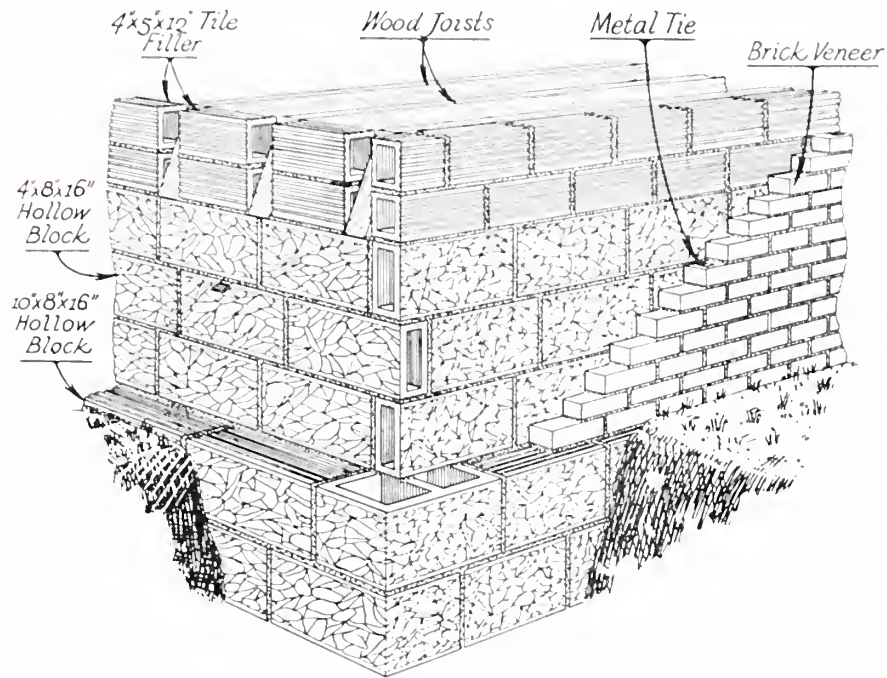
Exterior of ten-inch hollow block foundation wall with eight-inch brick veneer wall above grade, illustrating method of stepping back eight-inch section and method of bonding veneer to 4"x8"x16" hollow block backing with metal ties.
